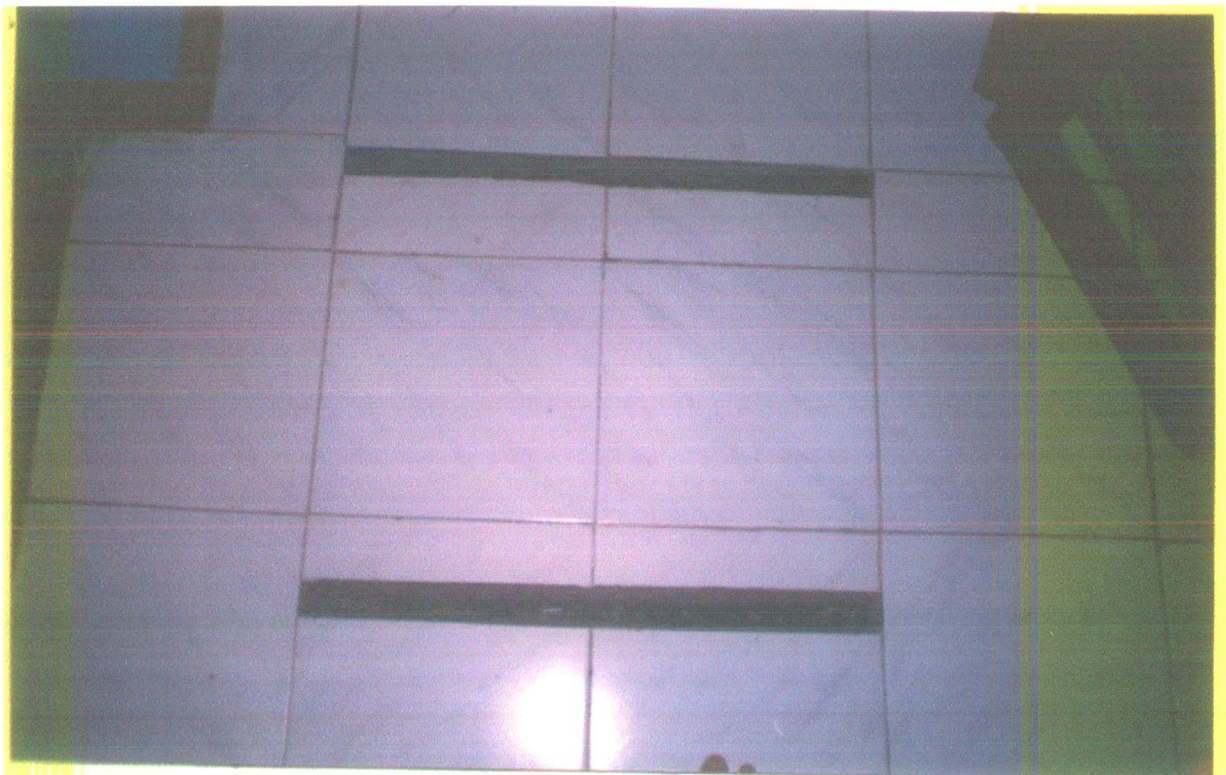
View of Openings Provided in Flooring of Kalamdari House
